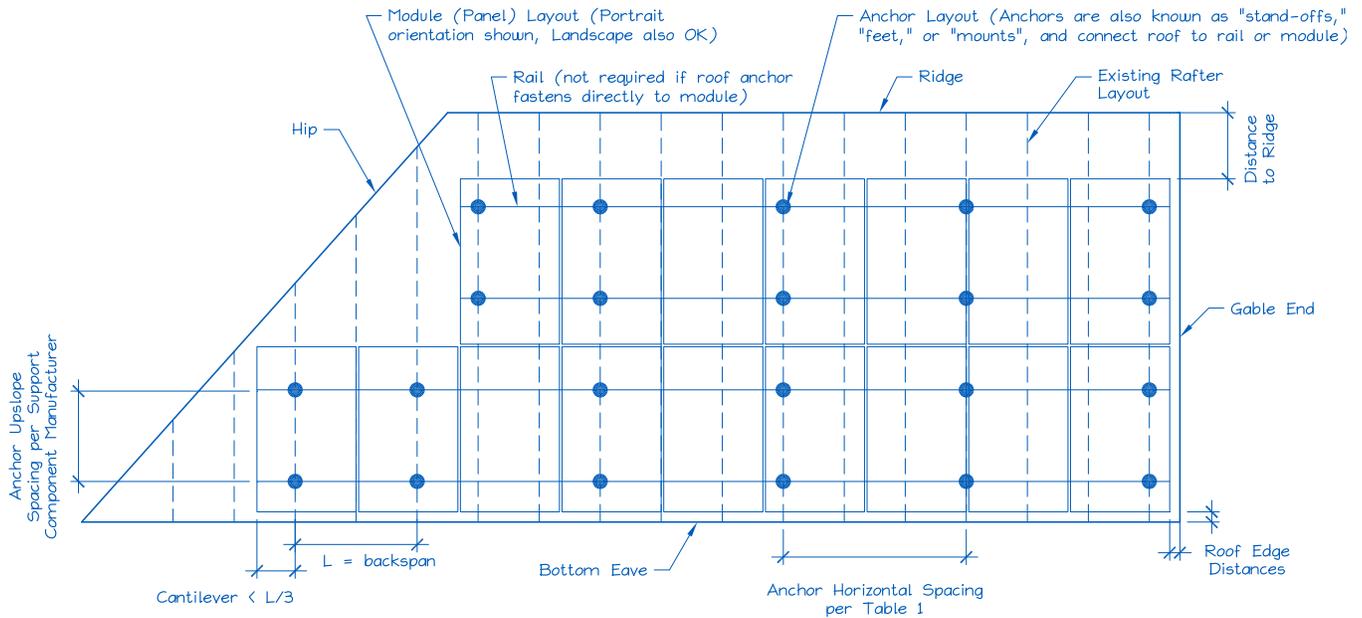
Sample Solar Panel Array and Anchor Layout Diagram (Roof Plan).
